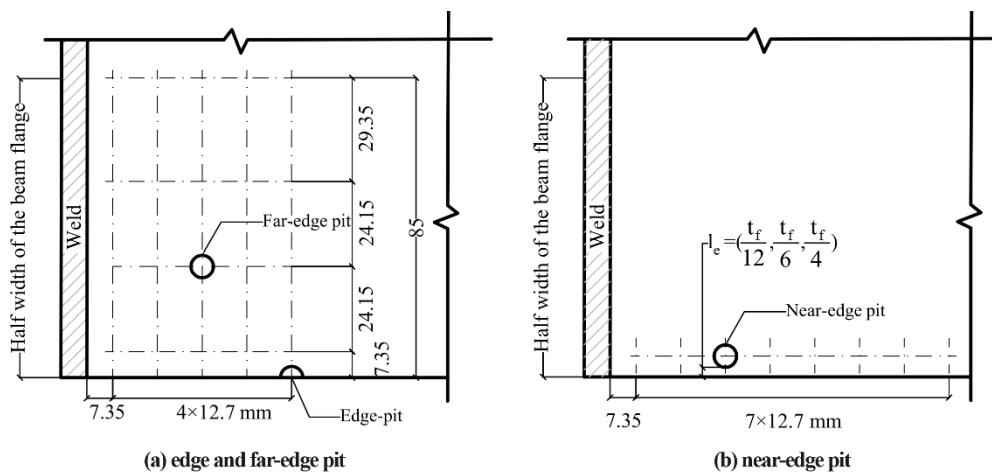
Pit location grid on the flange of the beam (all dimensions are in mm).
